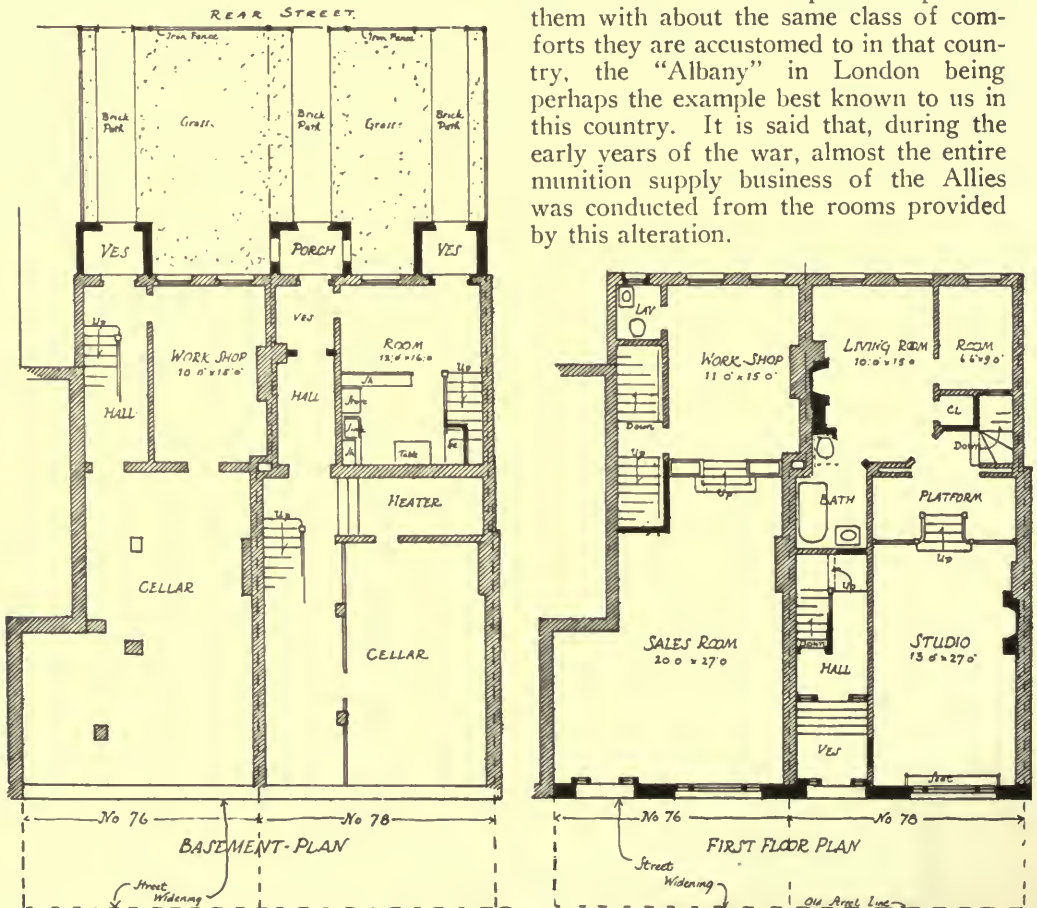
BASEMENT AND FIRST FLOOR PLAN—ALTERATIONS OF TWO OLD BUILDINGS ON BEACON HILL, BOSTON, TO BUSINESS, STUDIO AND APARTMENT USES.
